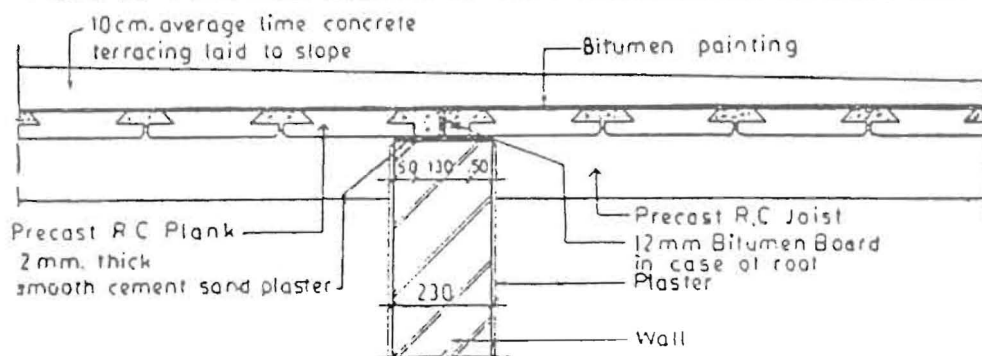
(b) : DETAIL FOR PLANKS BEARING AT ROOF TO AVOID LEAKAGE
